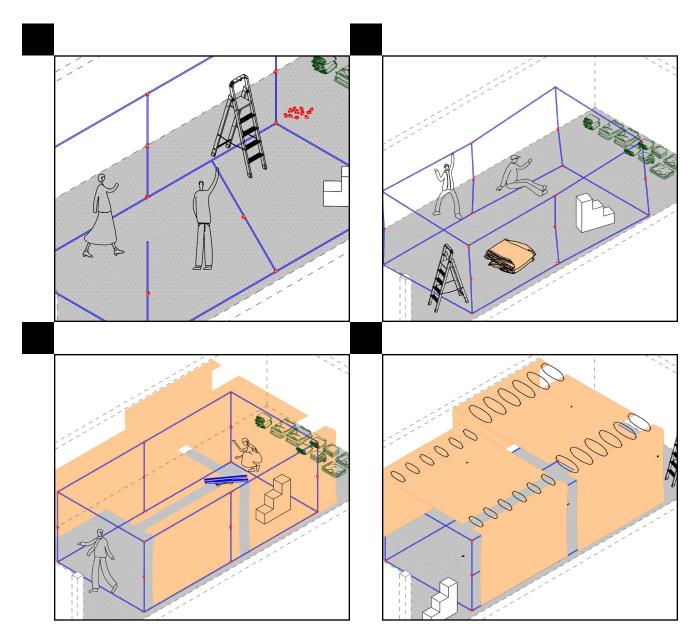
Construction 7: Connections and Laying Out Exterior Drop Sheet. Diagram by Author (2024).
